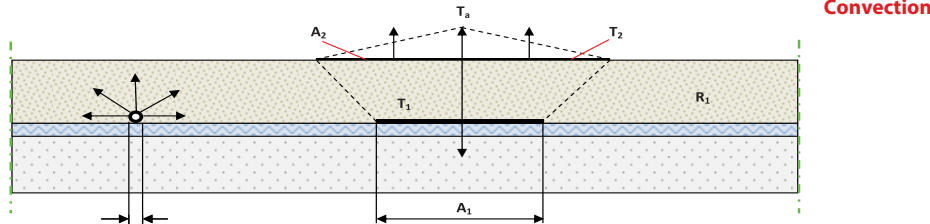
shows a cross sectional area of a floor with a cable or tubing and STEP Warmfloor® flat element
